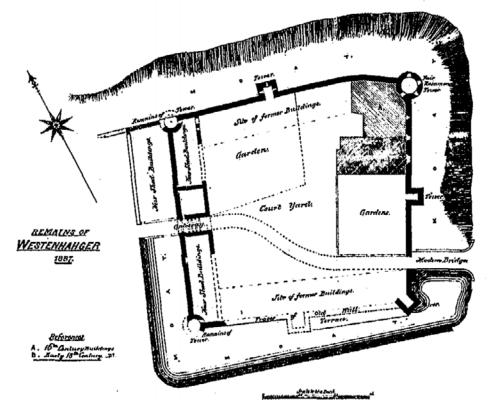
Plan dating to 1887 (Archaeologia Cantina, 1887)
